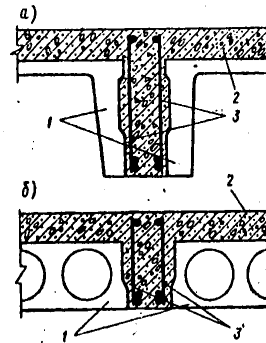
Schematic of positioning of reinforcing cages between precast elements of precast-monolithic overhead cover of shelter
